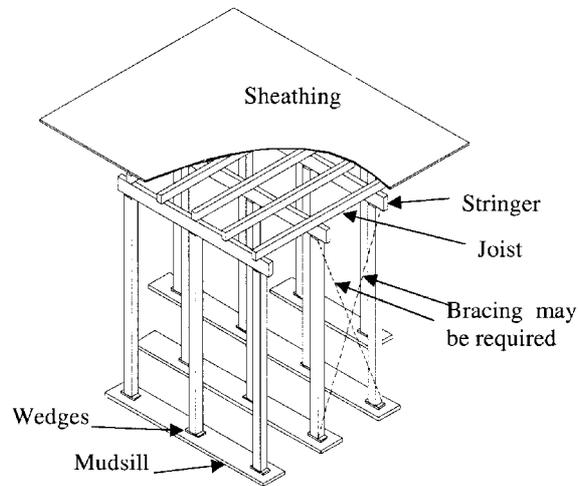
A typical structural system for all-wood slab formwork (Spiegel and Limbrunner 1991)
